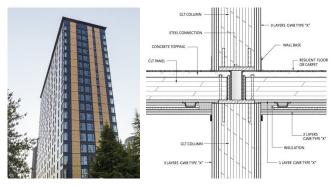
Brock Commons and a detail of the steel conector (32, 33).
